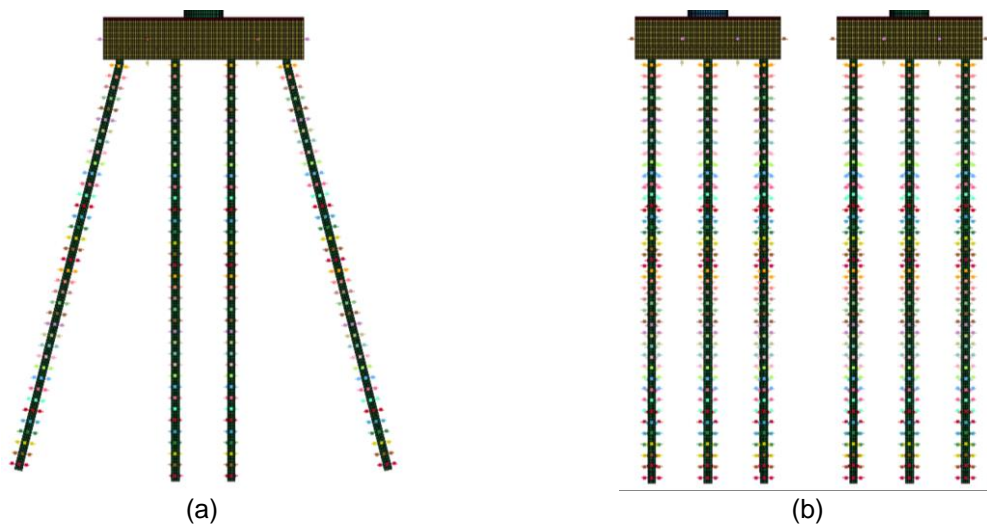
Details of the frame pier's deep foundation: (a) view in pier's longitudinal direction and (b) side view from road
